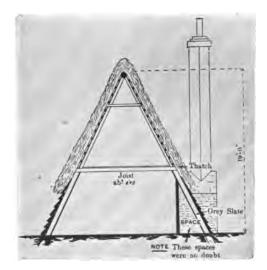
Cross-section of Teapot Hall. (The chimney is modern.)
